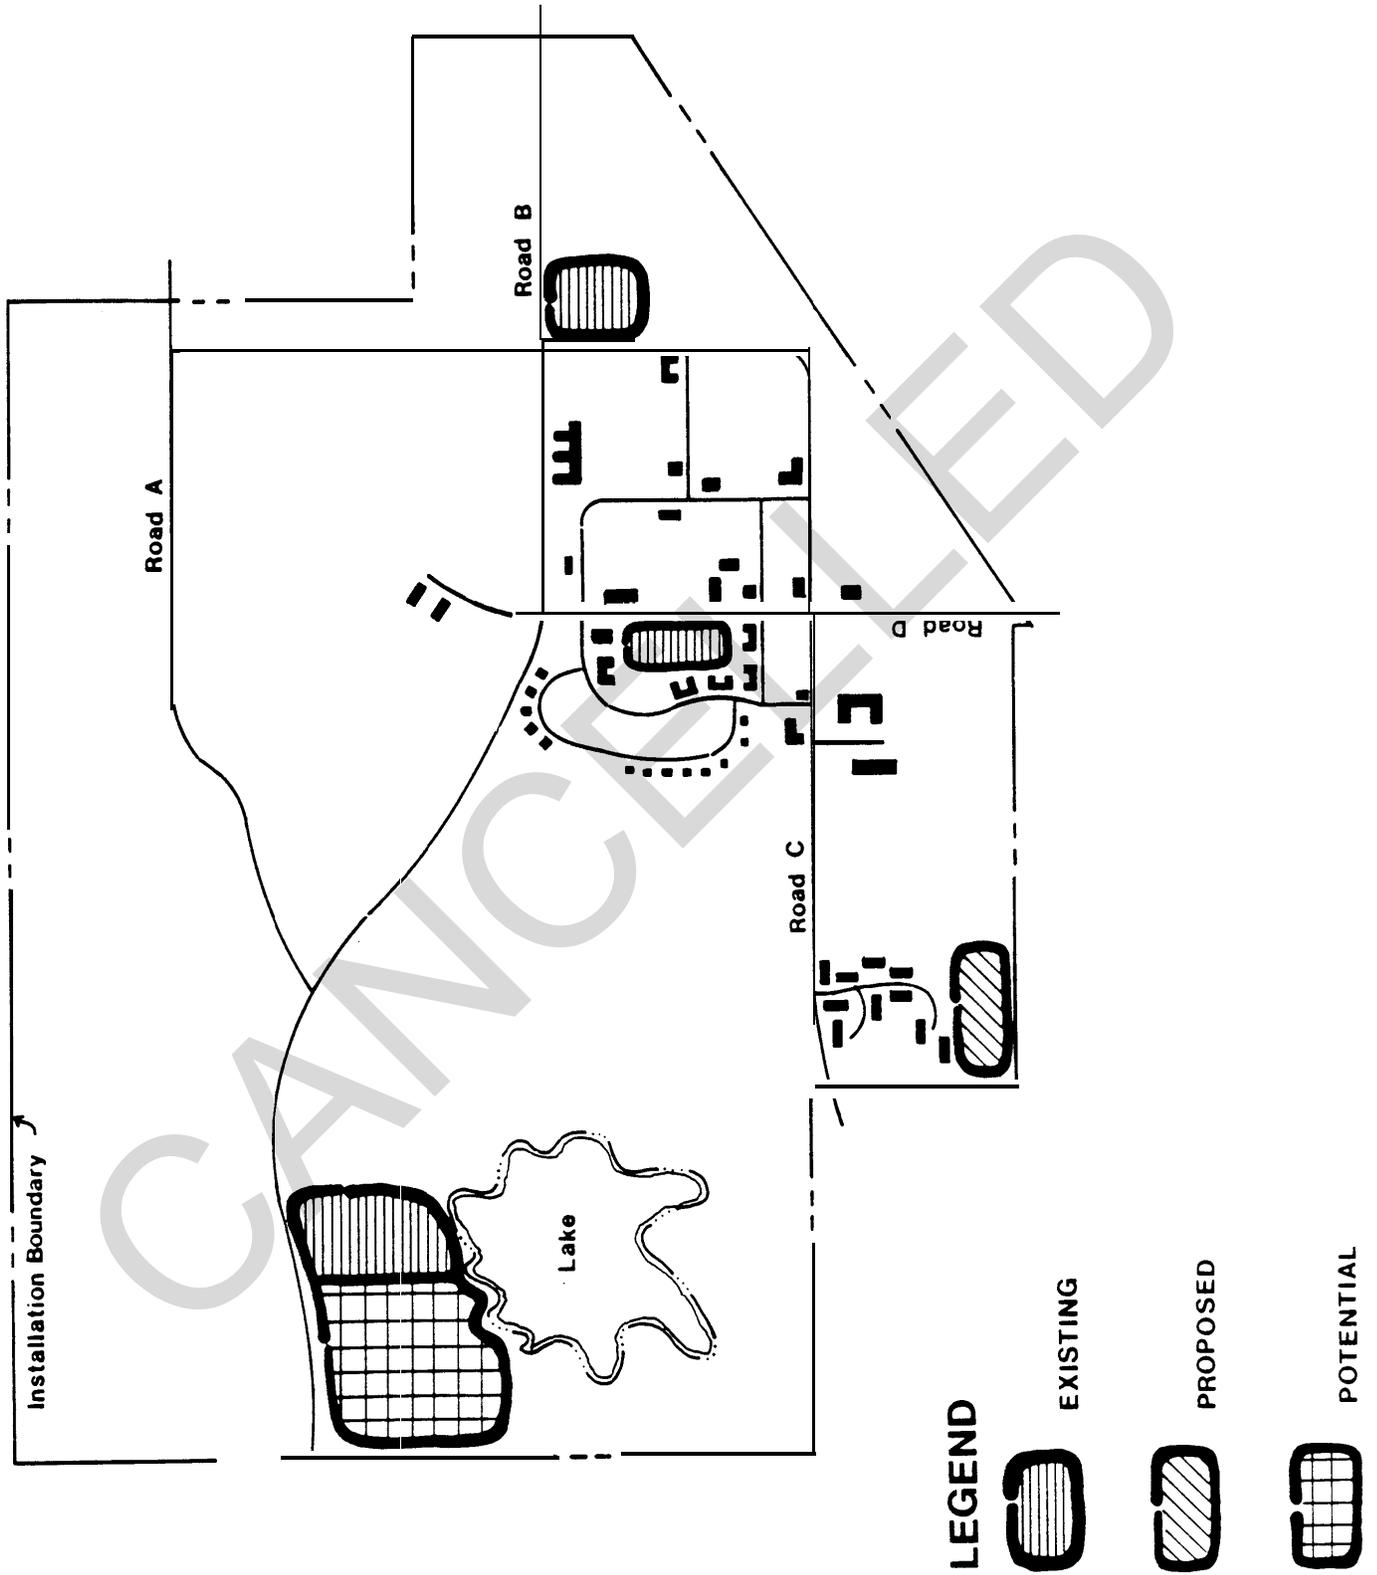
Existing, proposed and potential outdoor recreation areas.
